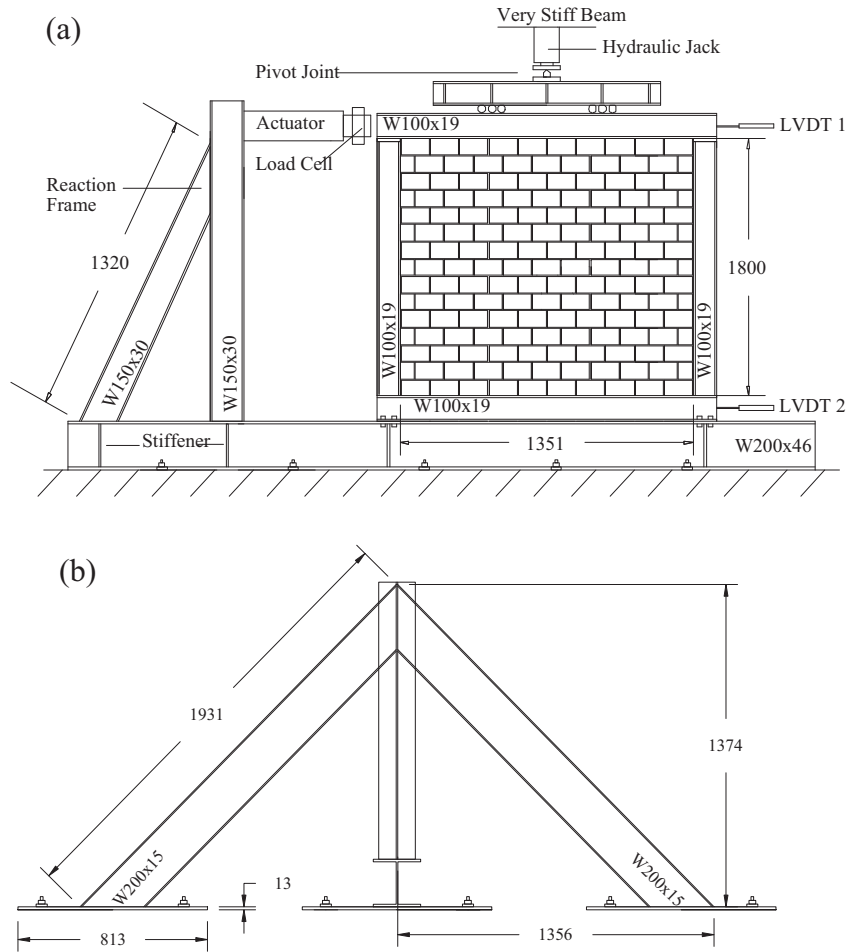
Test setup, dimensions in mm: (a) schematic view; and (b) out-of-plane bracing for the loading column.
